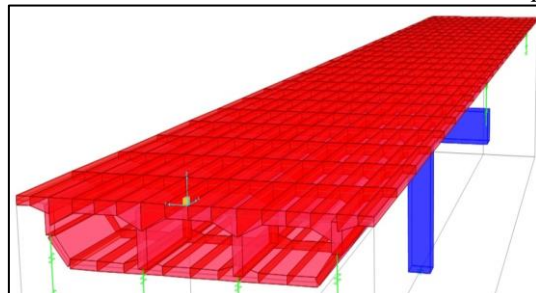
Multi Cell Box Girder of Exterior Girders Clipped
